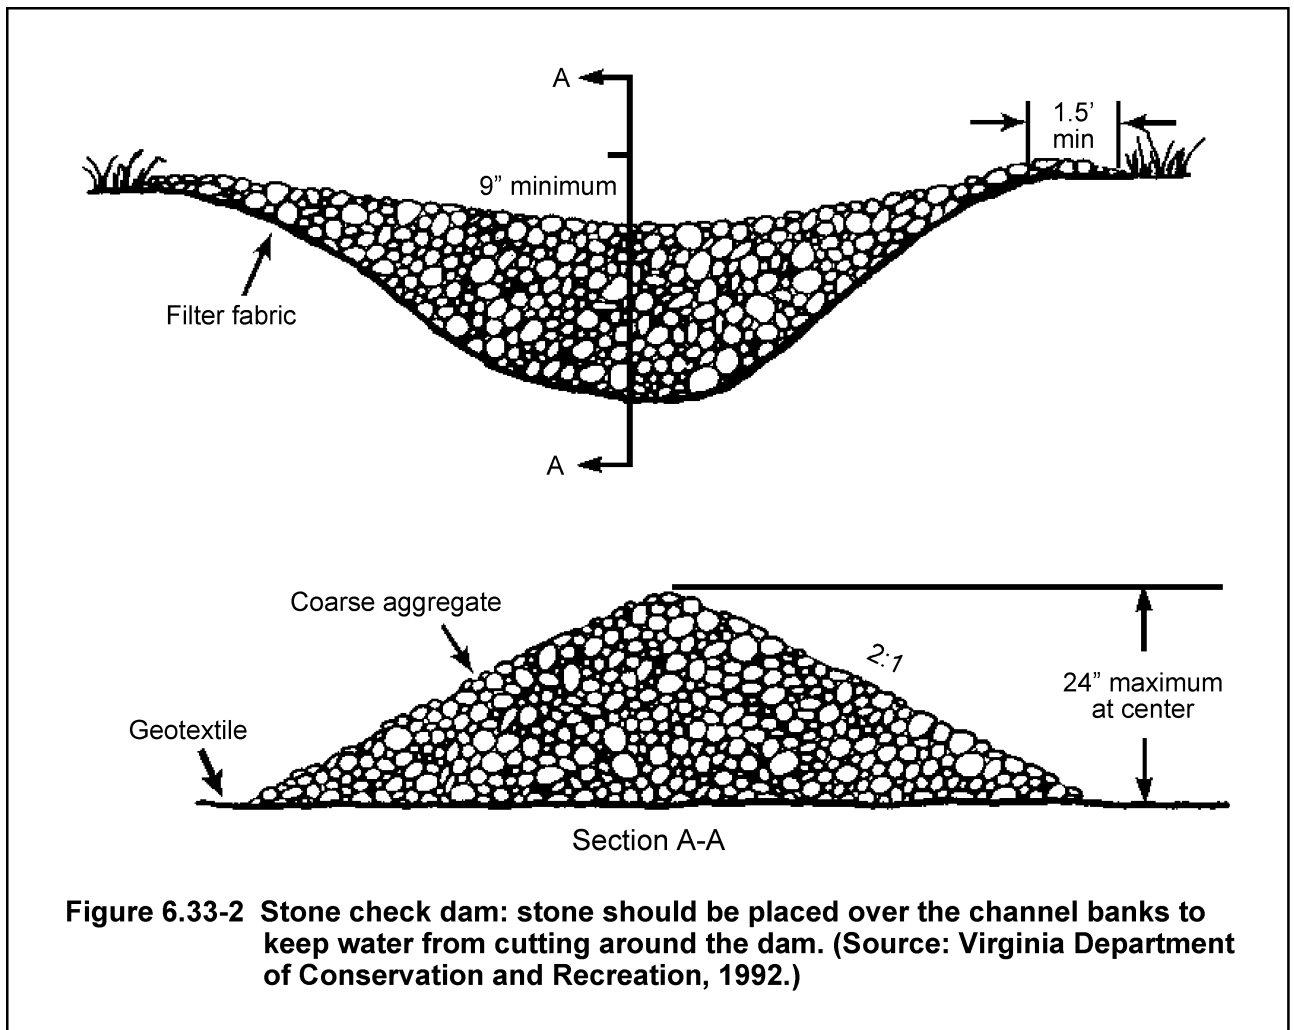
Stone check dam: stone should be placed over the channel banks to keep water from cutting around the dam. (Source: Virginia Department of Conservation and Recreation, 1992.)
